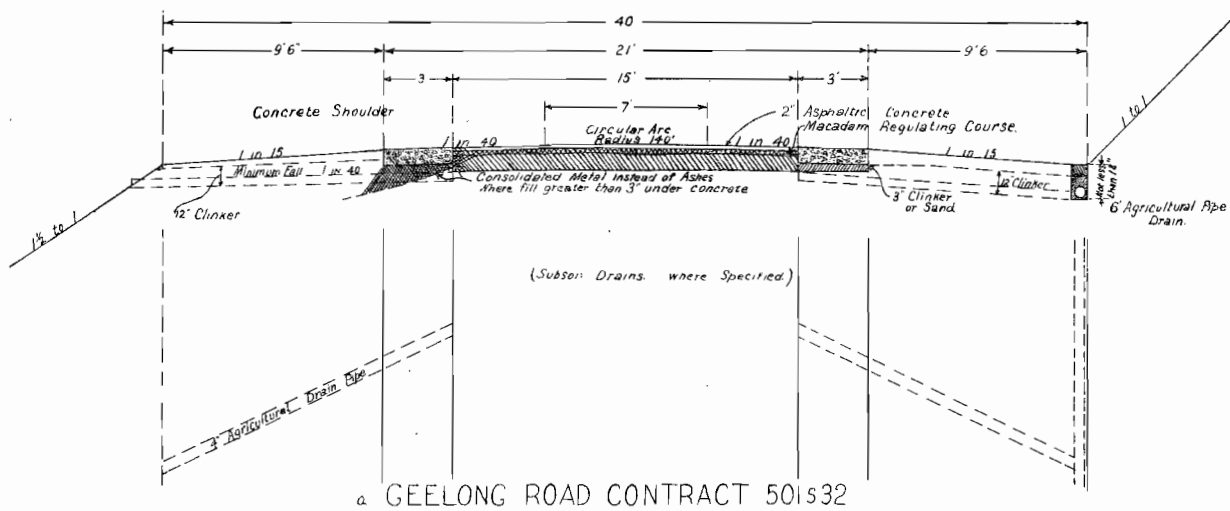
Typical Cross Sections.—Asphaltic Concrete Construction.
